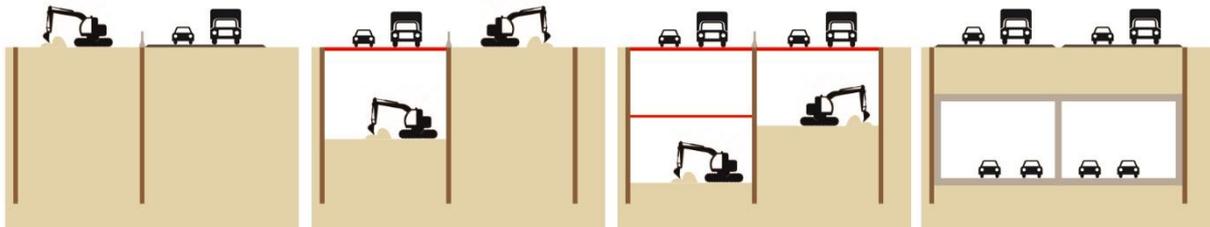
Principle of the Cut and Cover tunnel excavation method.
